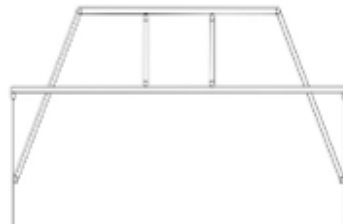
Longjin Bridge, Pingnan County, Fujian Province
